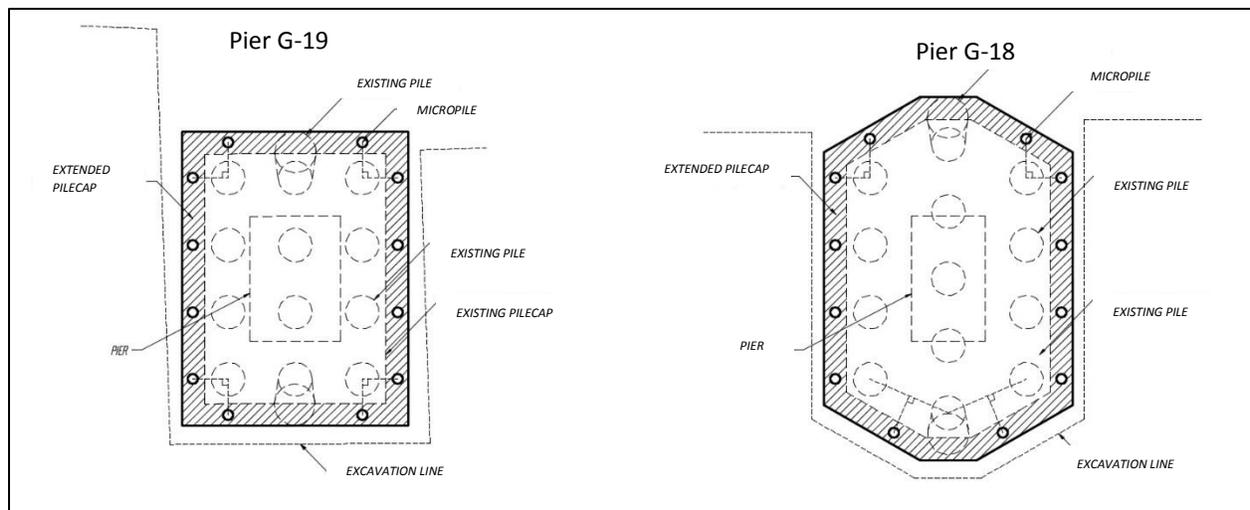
Plan view of the pilecaps supporting Georgia viaduct piers in the subject site area (GeoPacifc's Drawing)
